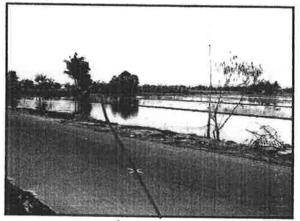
Taken at Sta. 5+564. Alignment crossing the Balagtas-San Jose Road in Brgy. Bulihan, Plaridel, (looking north).
